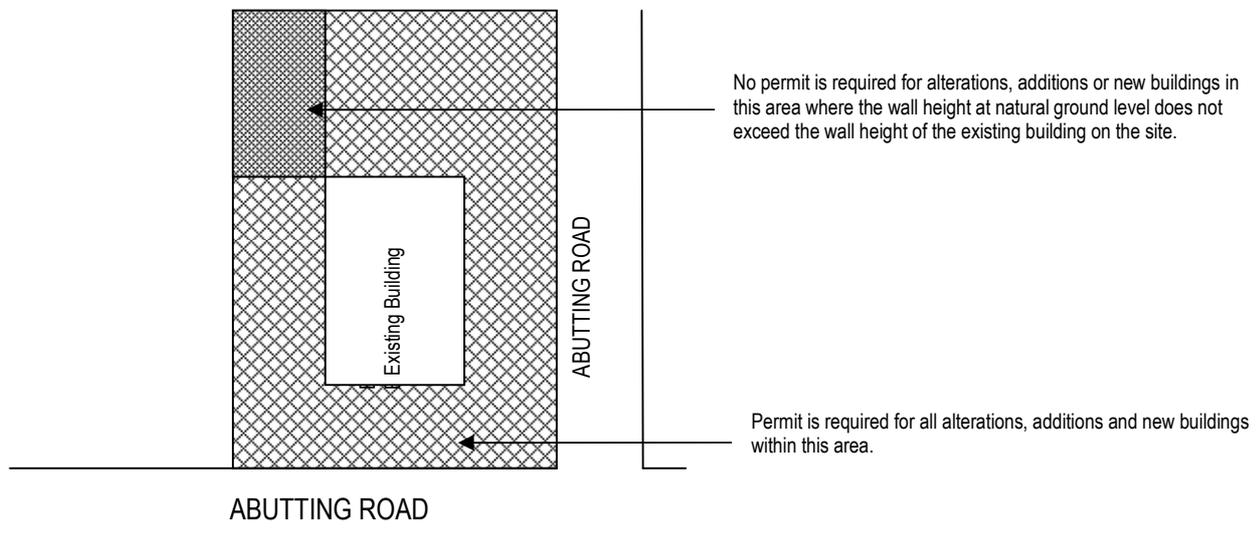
Exemptions for alterations, additions and new buildings for non-contributory places on a corner site within the Heritage Overlay.
